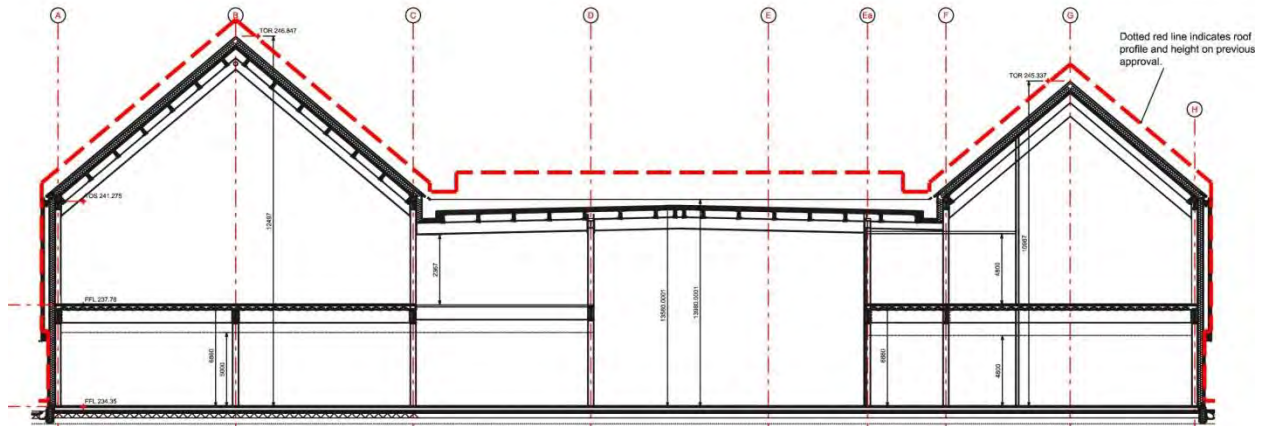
Proposed lowered section with previously consented outline shown dotted.
